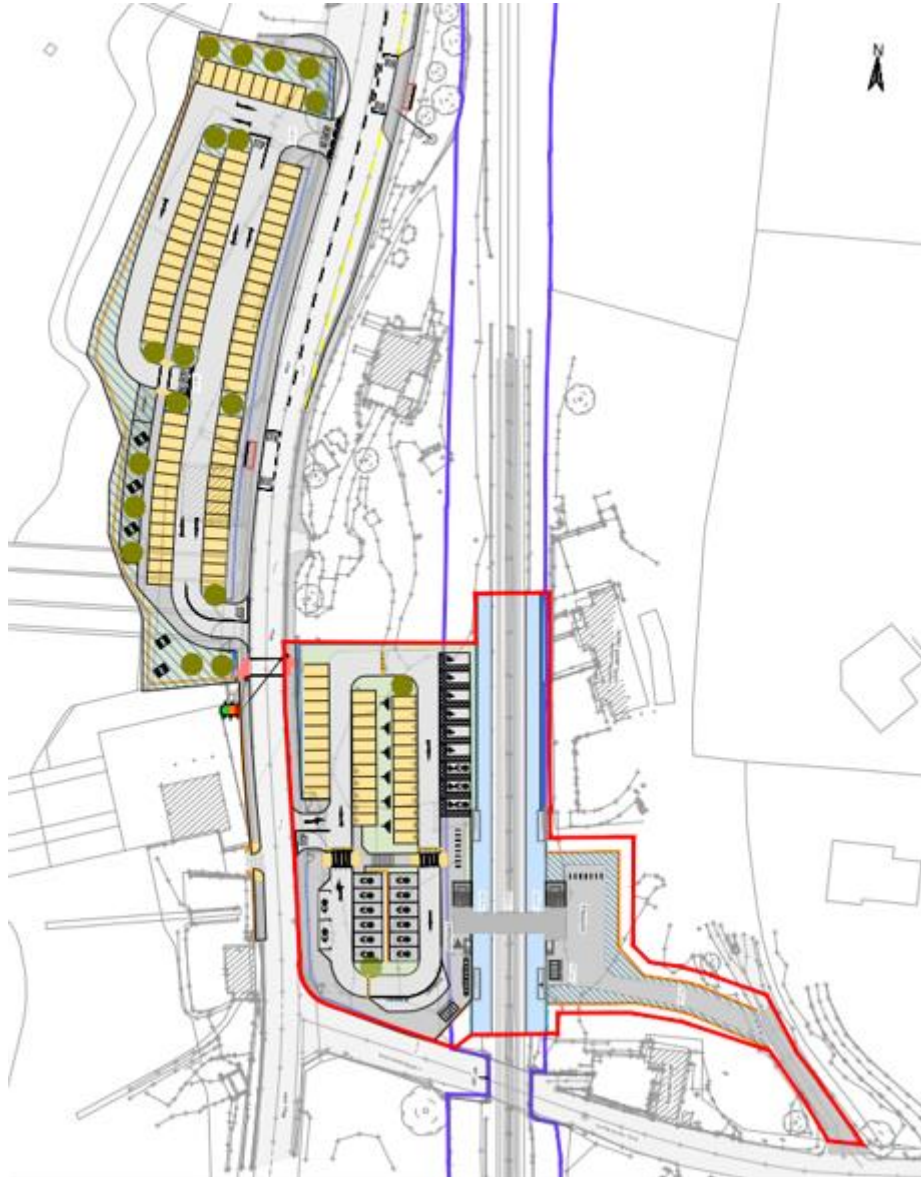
Ballynoe Station and Local Park and Ride Layout
